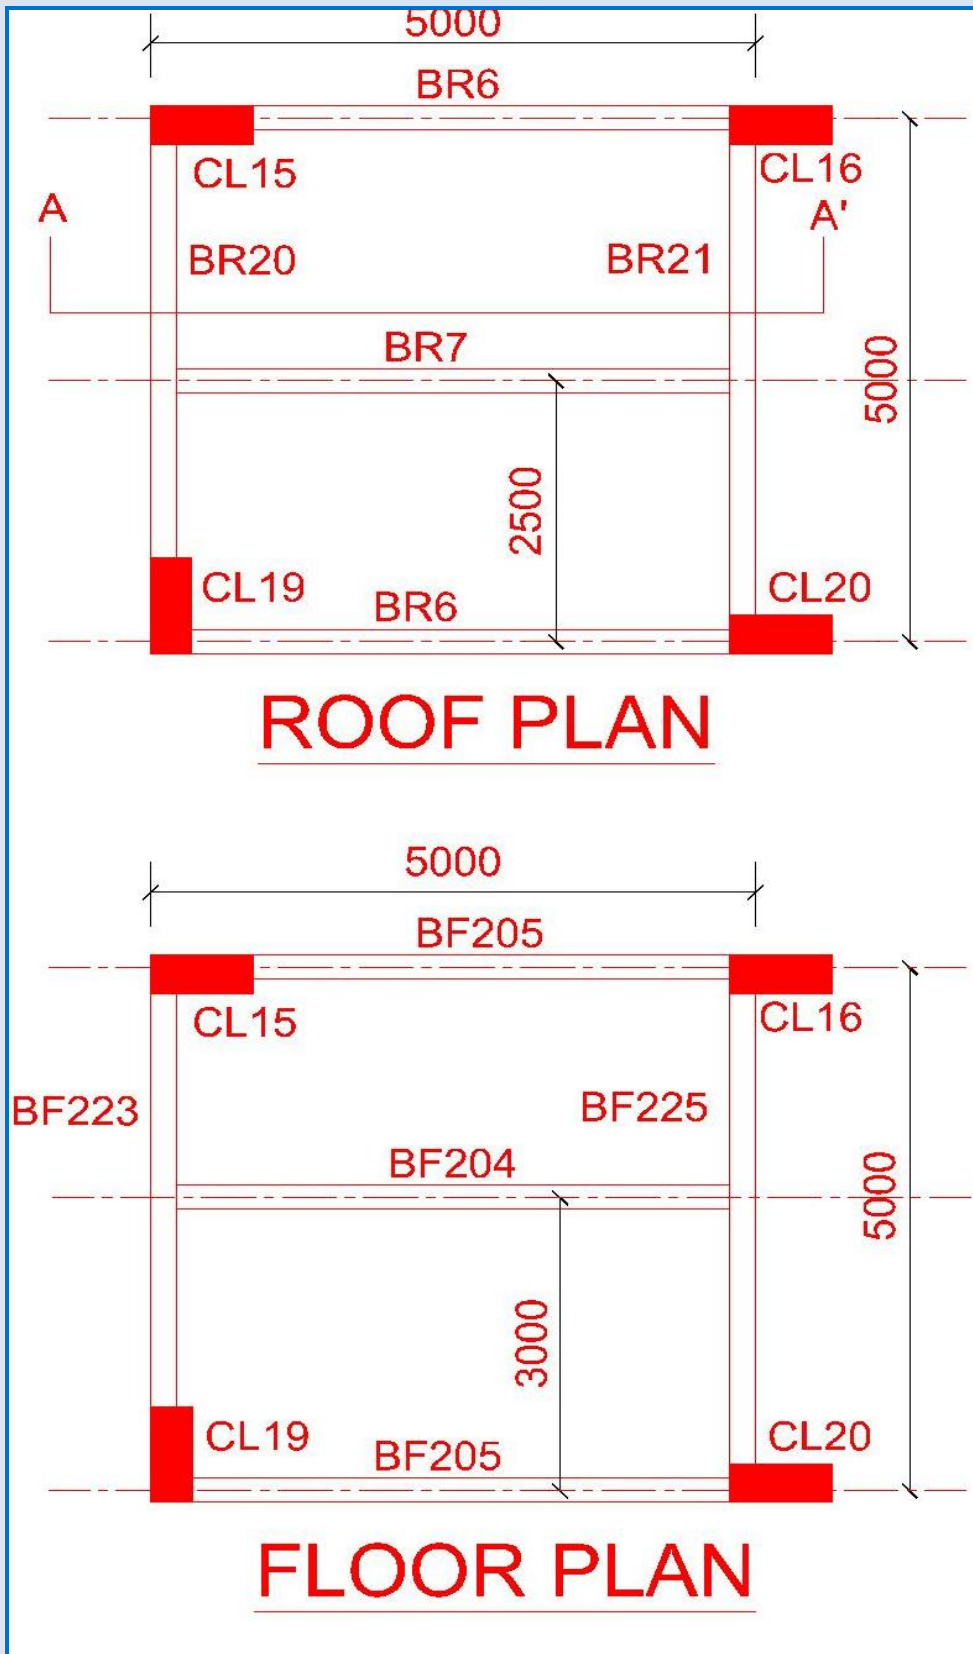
Roof Plan & Floor Plan of Structure [4]
